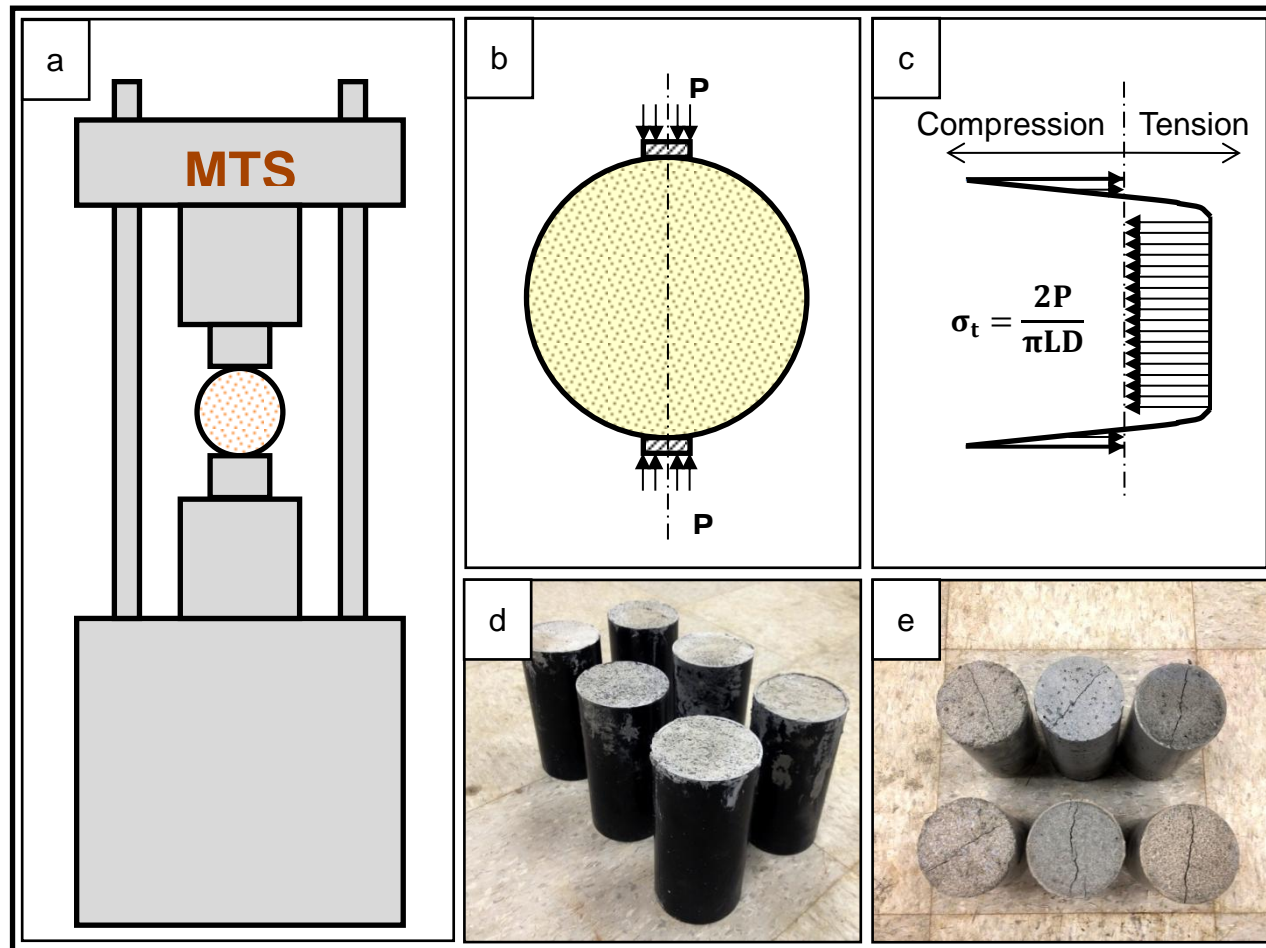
Splitting tensile test: (a) schematic view of test setup, (b) schematic view of cylinder specimen under compressive load, (c) stress profile in cylinder specimens, (d) unmolded mortar cylinders, (e) failed specimens
